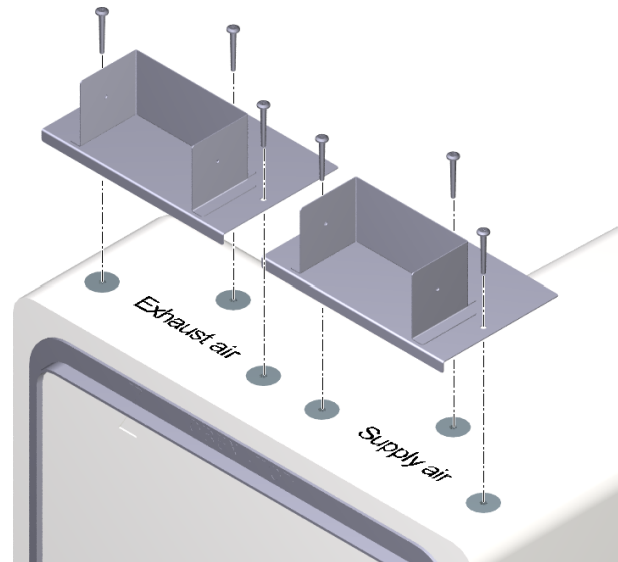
M-WRG-M/MB-FK2, Fixing the fixing plates for exhaust air and supply air
